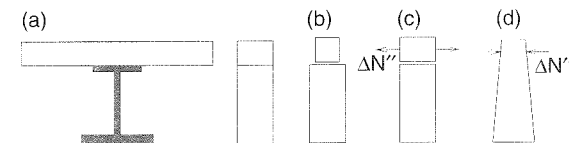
Restrained shrinkage of a concrete slab on a steel beam
